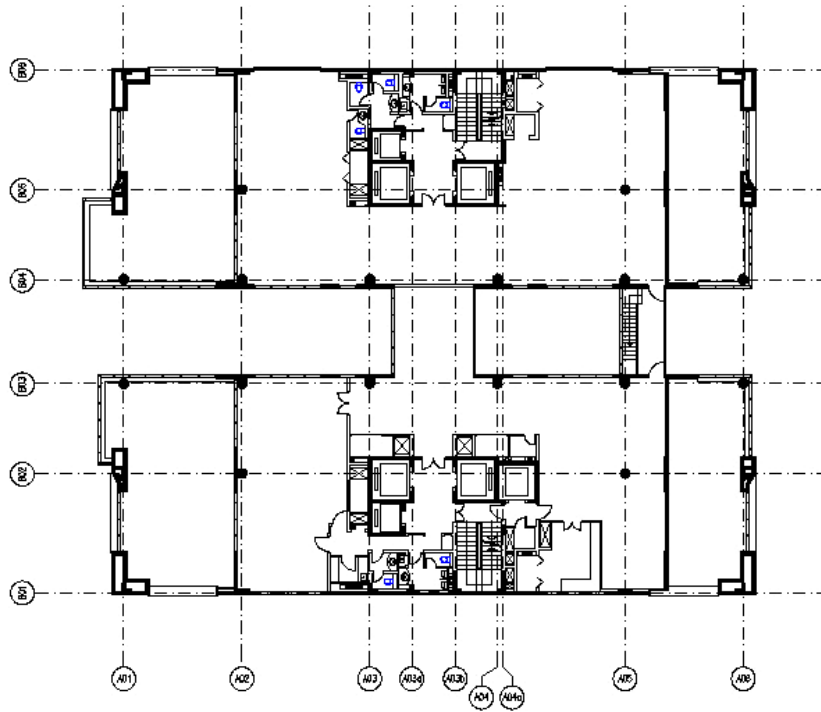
Birla Corporate Office, New Delhi: Tenth Floor Plan
